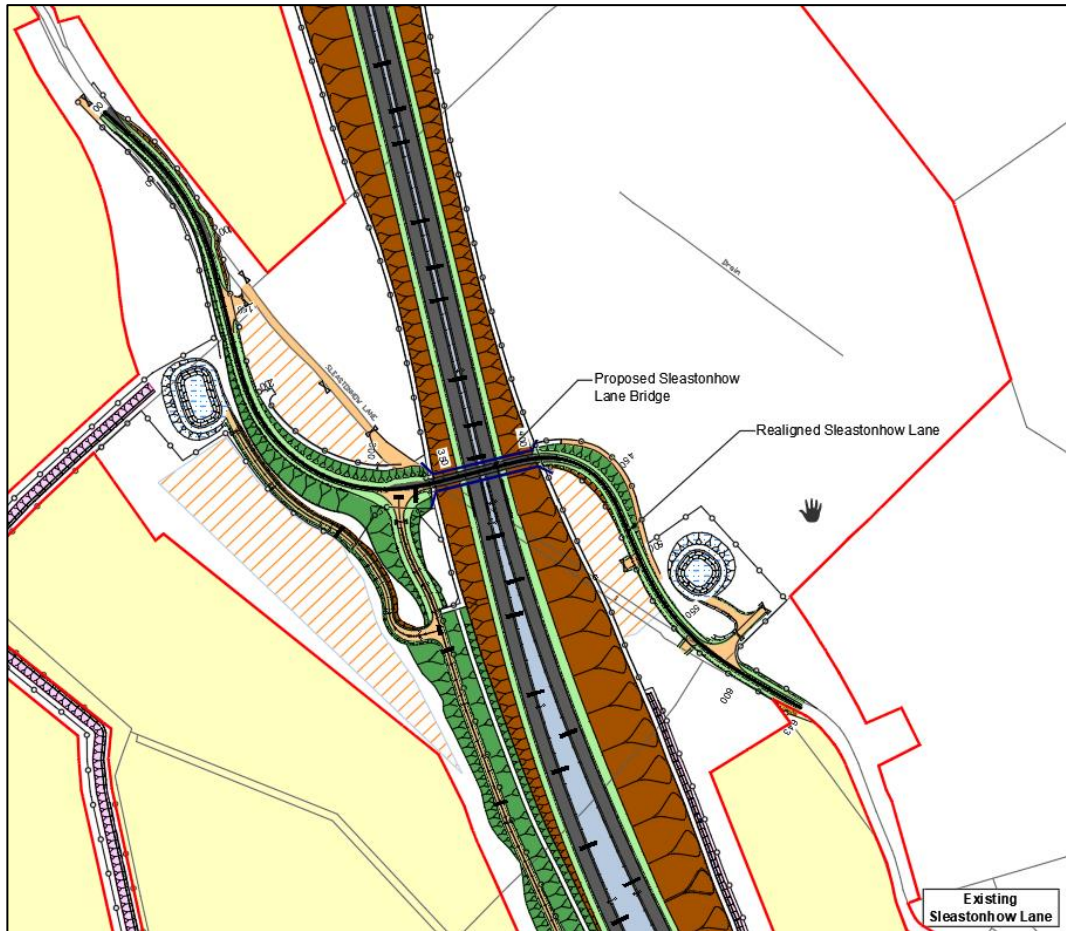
(b) Extract from General Arrangement Drawing (After)
